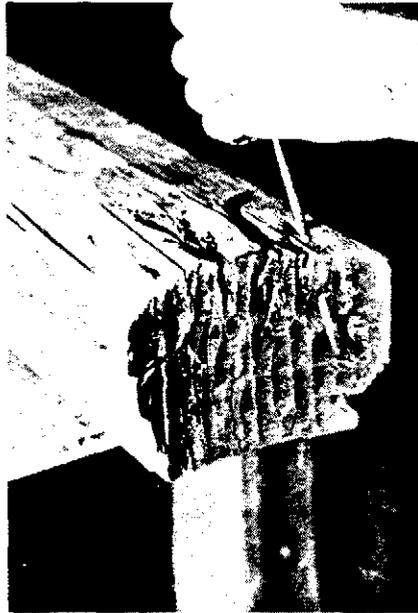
Longfellow House, Porch Handrail. Soft wood was removed from surface and cracks. Very narrow cracks were slightly enlarged to make filling with patching compound easier and to provide more area for bonding the patch. (Photo: Author)
